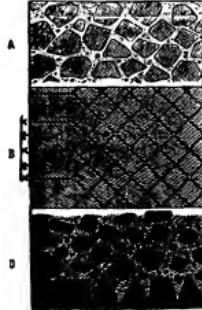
Concrete Wall faced with (A) Opus Incertum and (B) Opus Reticulatum. C shows the section, similar in both.
